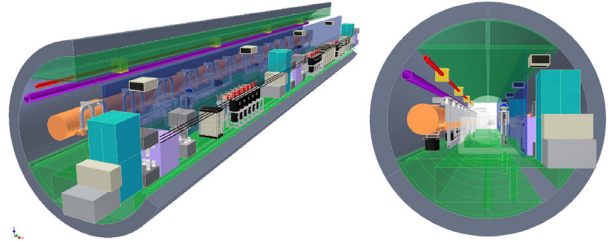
Tunnel layout. Left: bird's eye view and right: cross sectional view.
